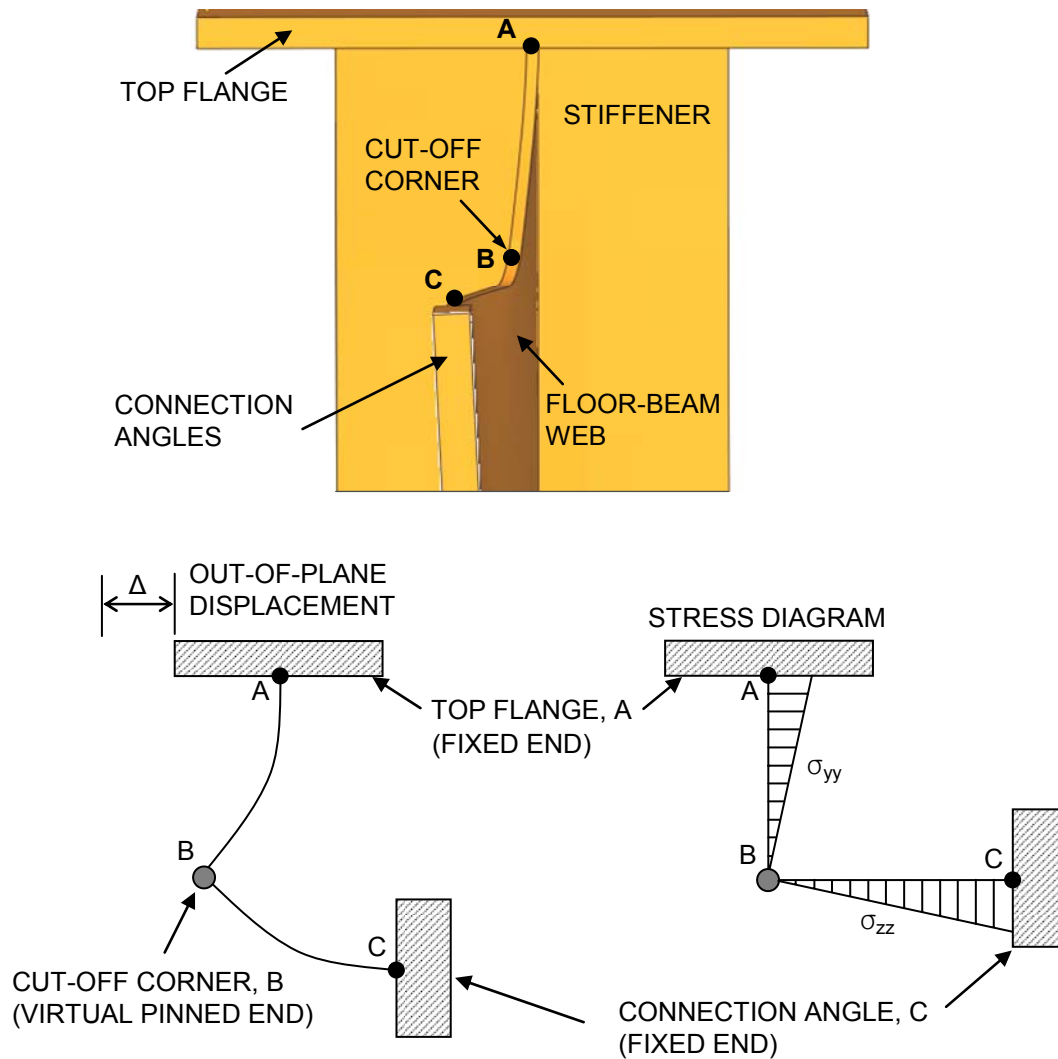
Modeling the structural behavior of the floor-beam system after retrofit.
